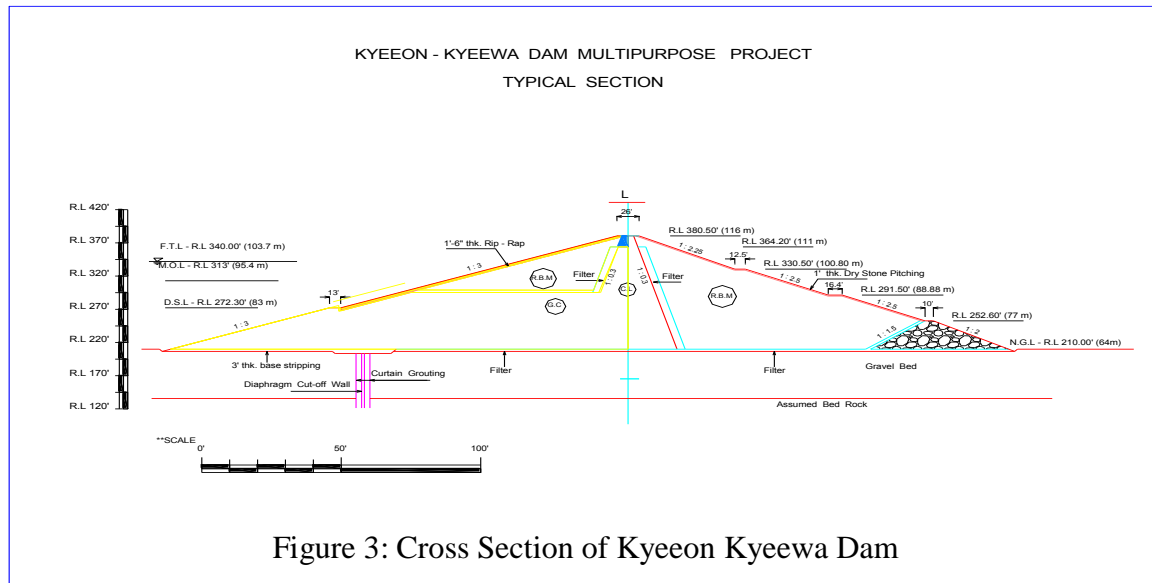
Cross Section of Kyeewon Kyeewa Dam
